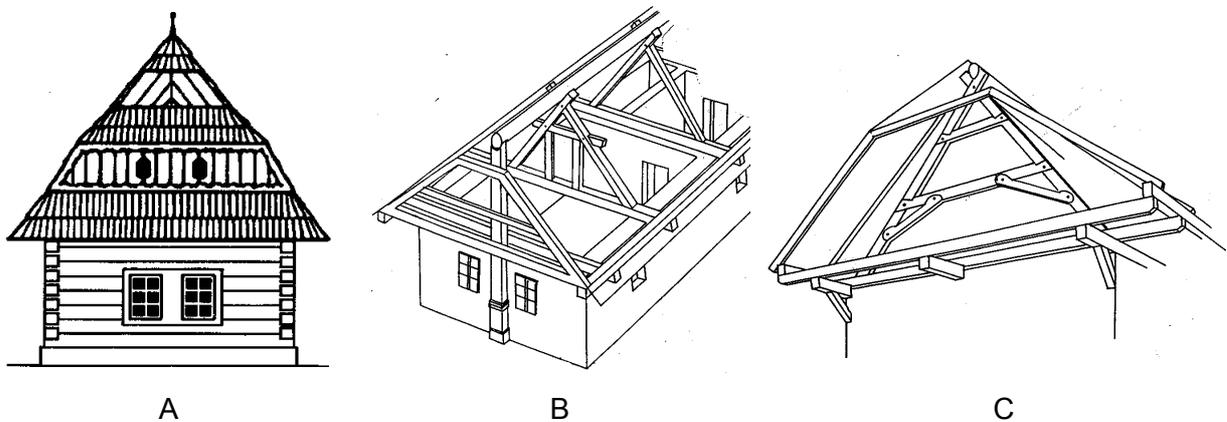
Typical country residential house (A), which roof construction has one top purlin supported by a shield stud (B), or has a collar accouplement support (C)
